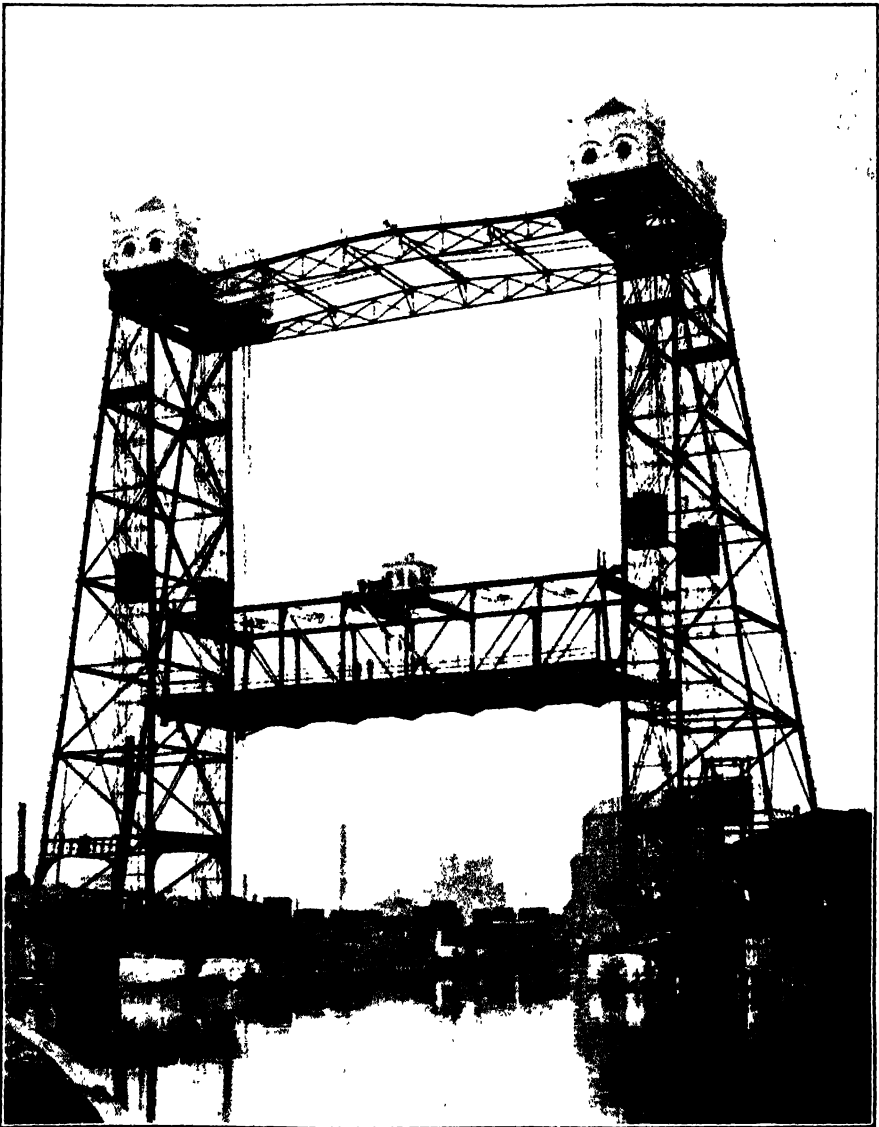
Halsted Street Lift Bridge over the Chicago River at Chicago, Ill.
